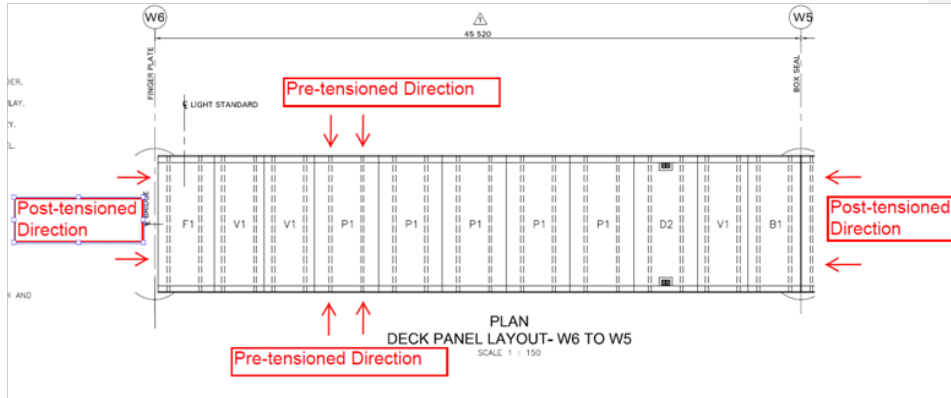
Deck Truss and Plated Girder Deck Panel Design
